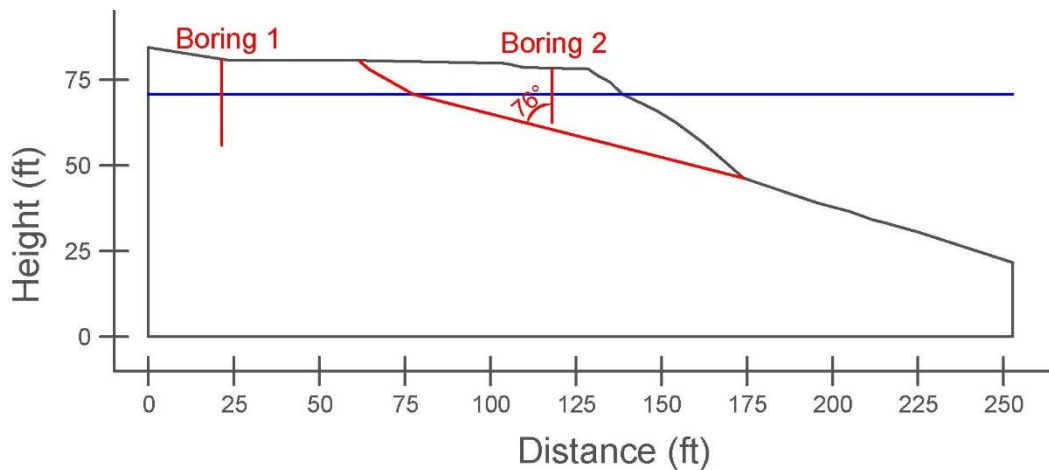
Sub-sectioning of the cross-section and failure plane for Lake Merced Bank
